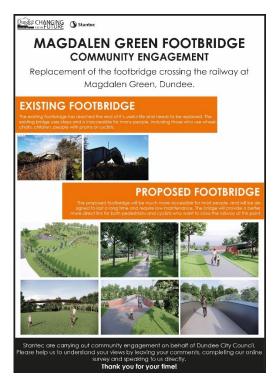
'Introduction' board used to show the existing and proposed footbridge designs
